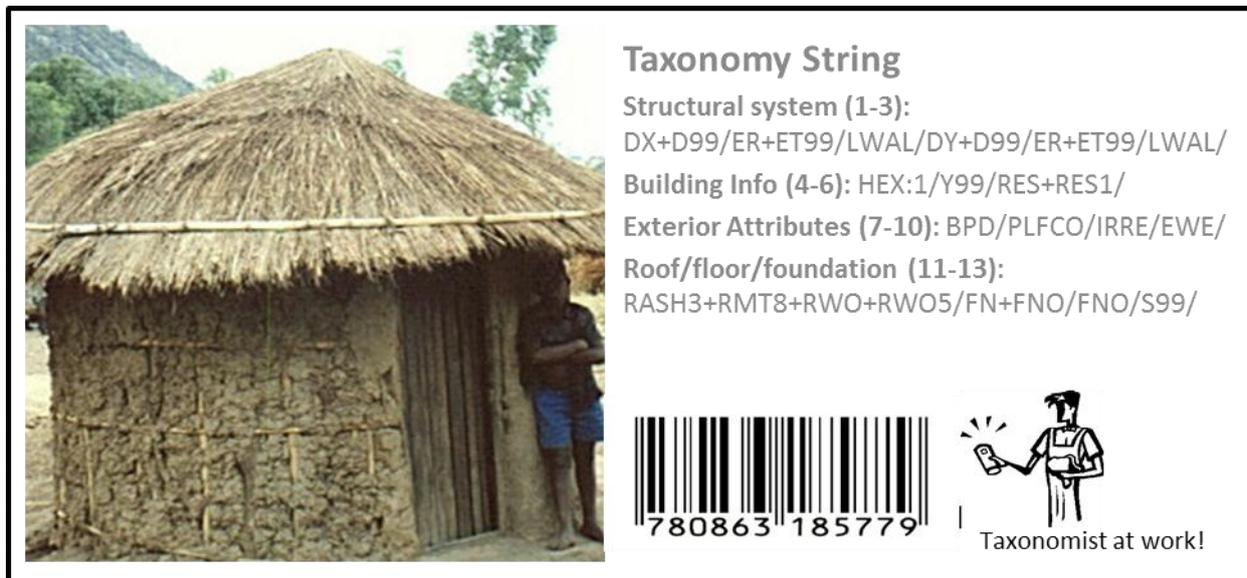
Taxonomy string is a bar code for a building. Photo: Rural Taxonomy mud wall building (Sassu and Ngoma, WHE Report 43).
